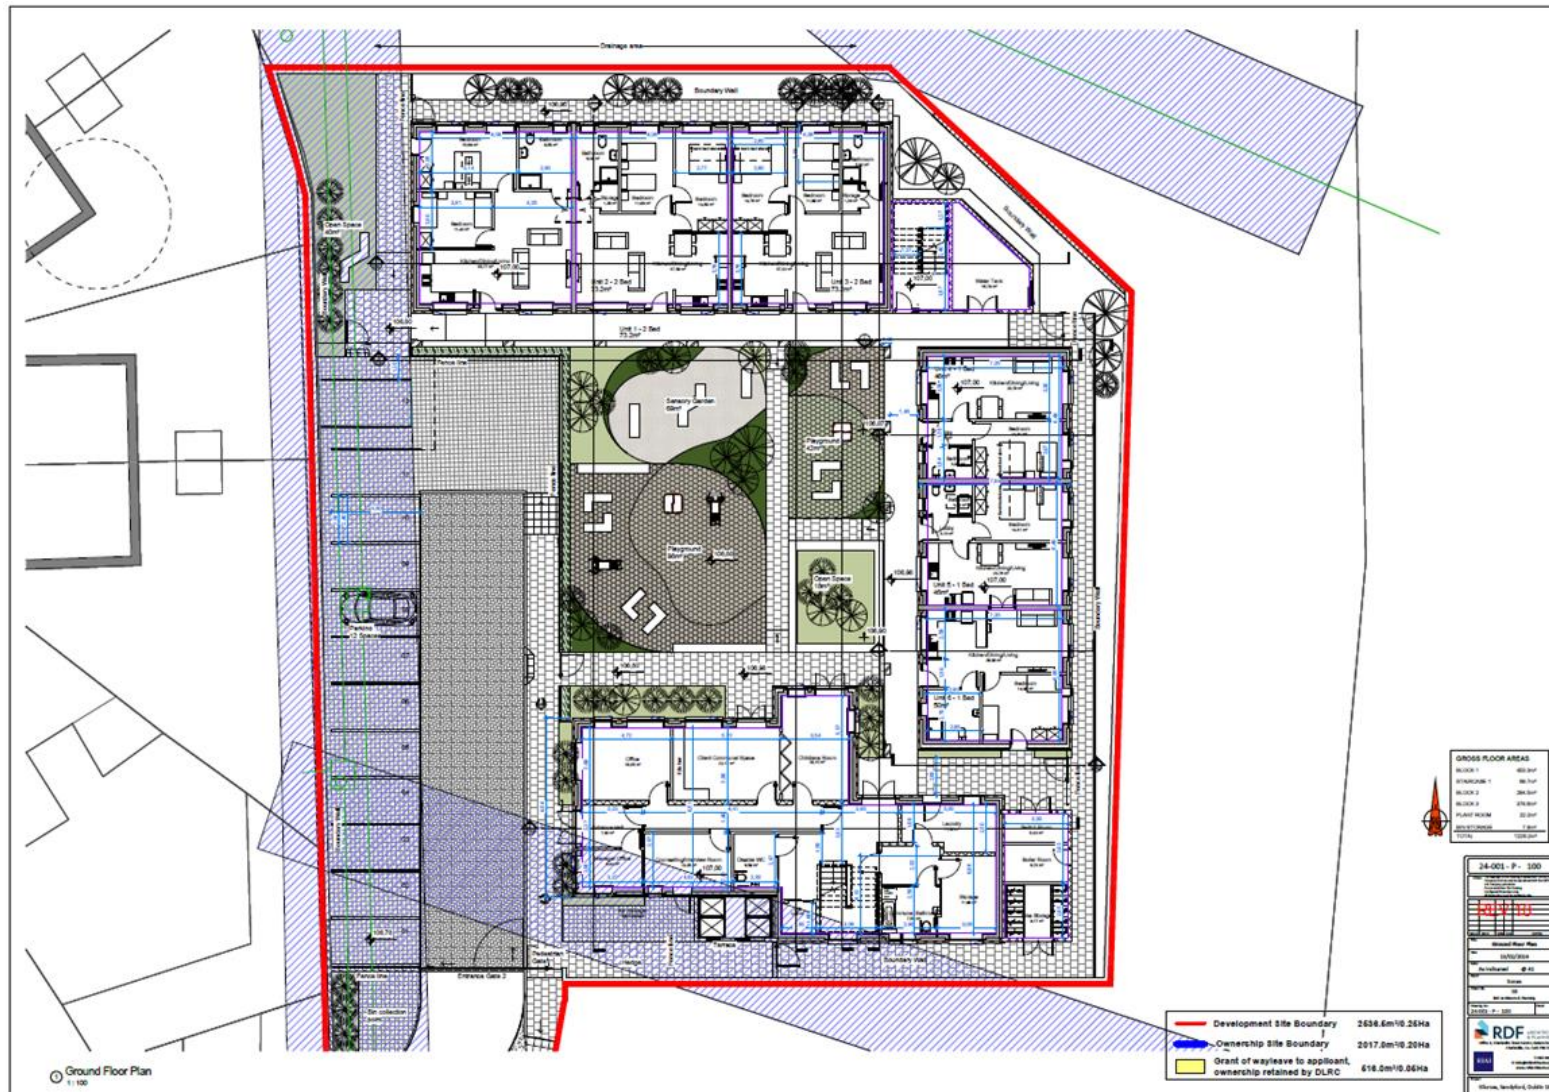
PROPOSED SITE LAYOUT (RDF ARCHITECTURE DRG No: 24-001-P-010)
